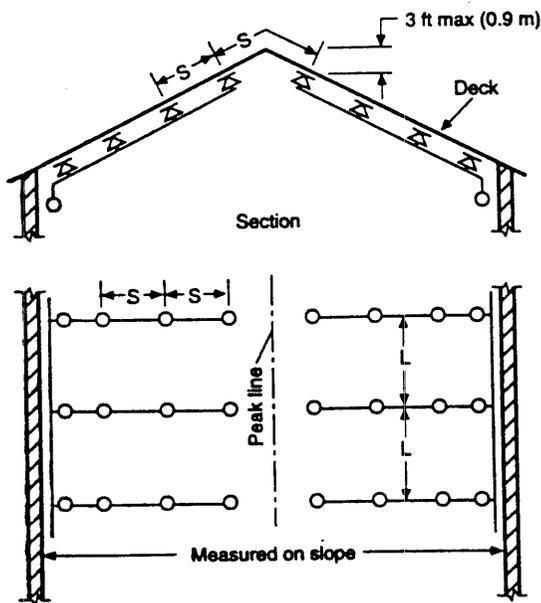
(b) Sprinklers at pitched roofs; branch lines run up the slope.
